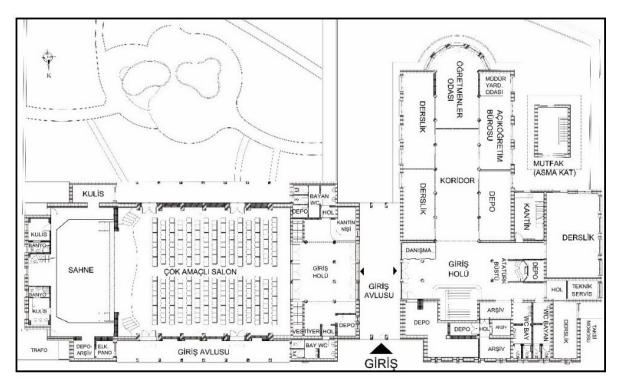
IHEM ground floor plan (Serimer Architecture Archive).
